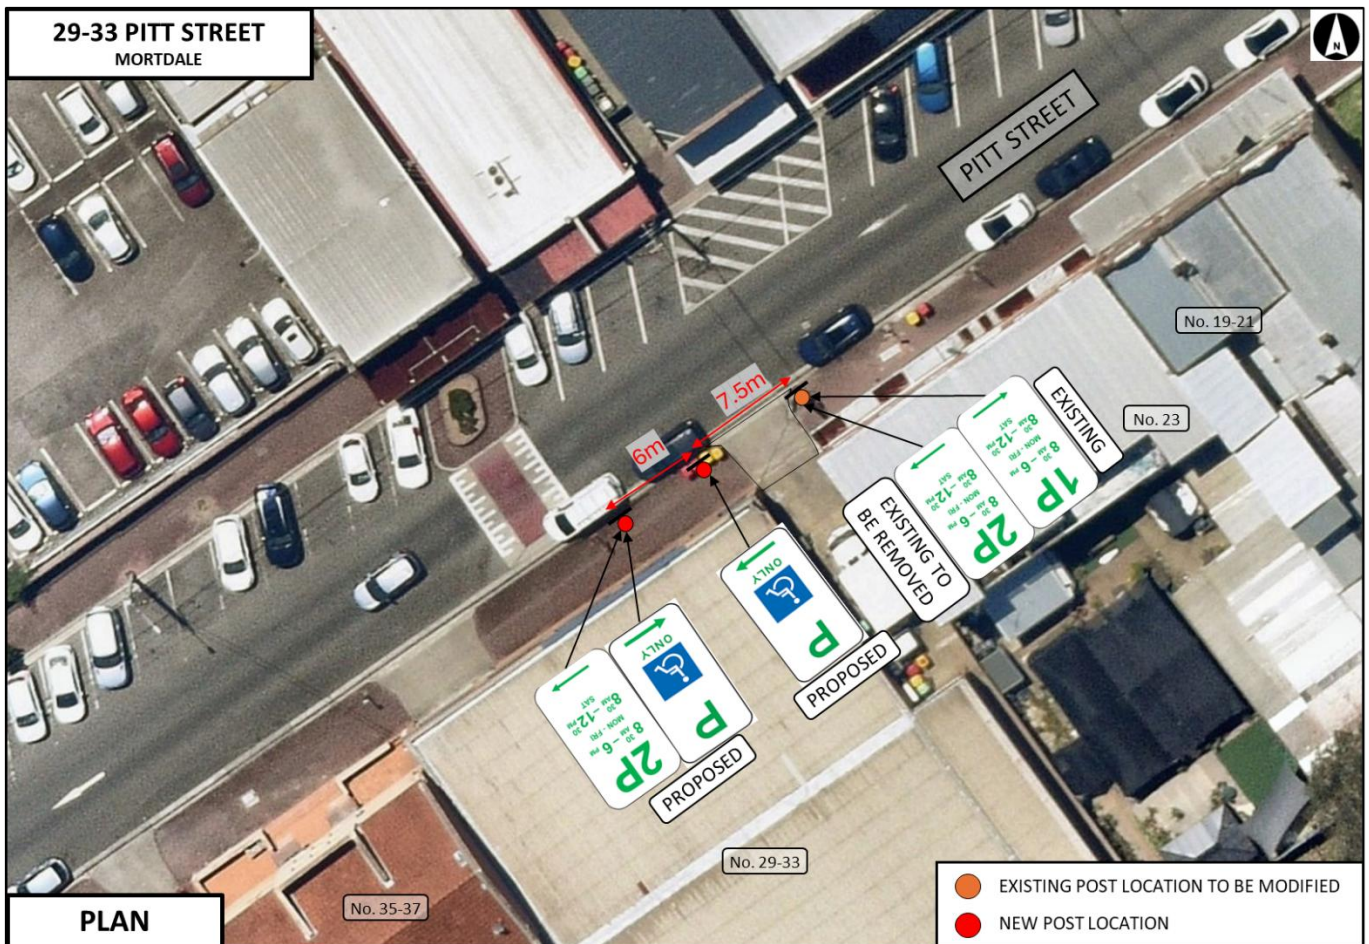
Plan of proposed 'Accessible Parking Zone' parking restriction.
